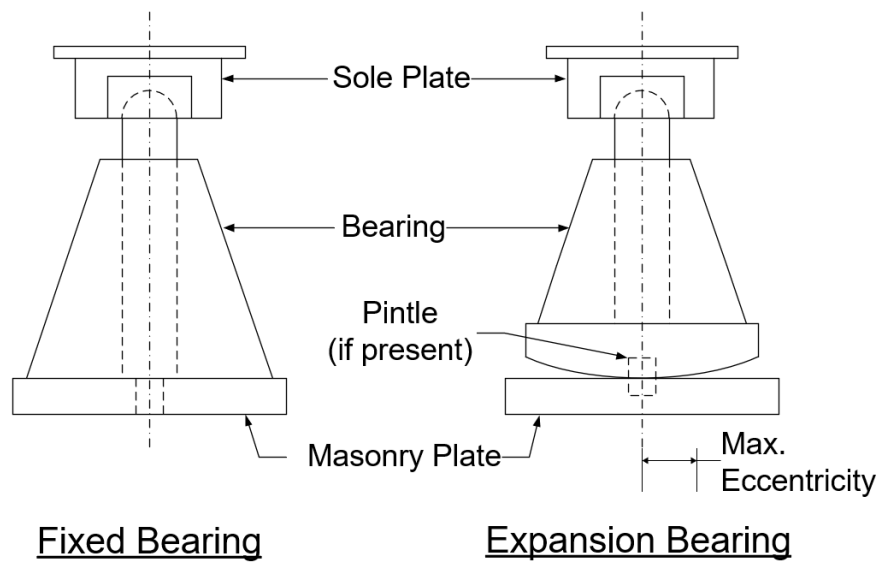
Typical Fixed and Expansion Rocker Bearing Details
